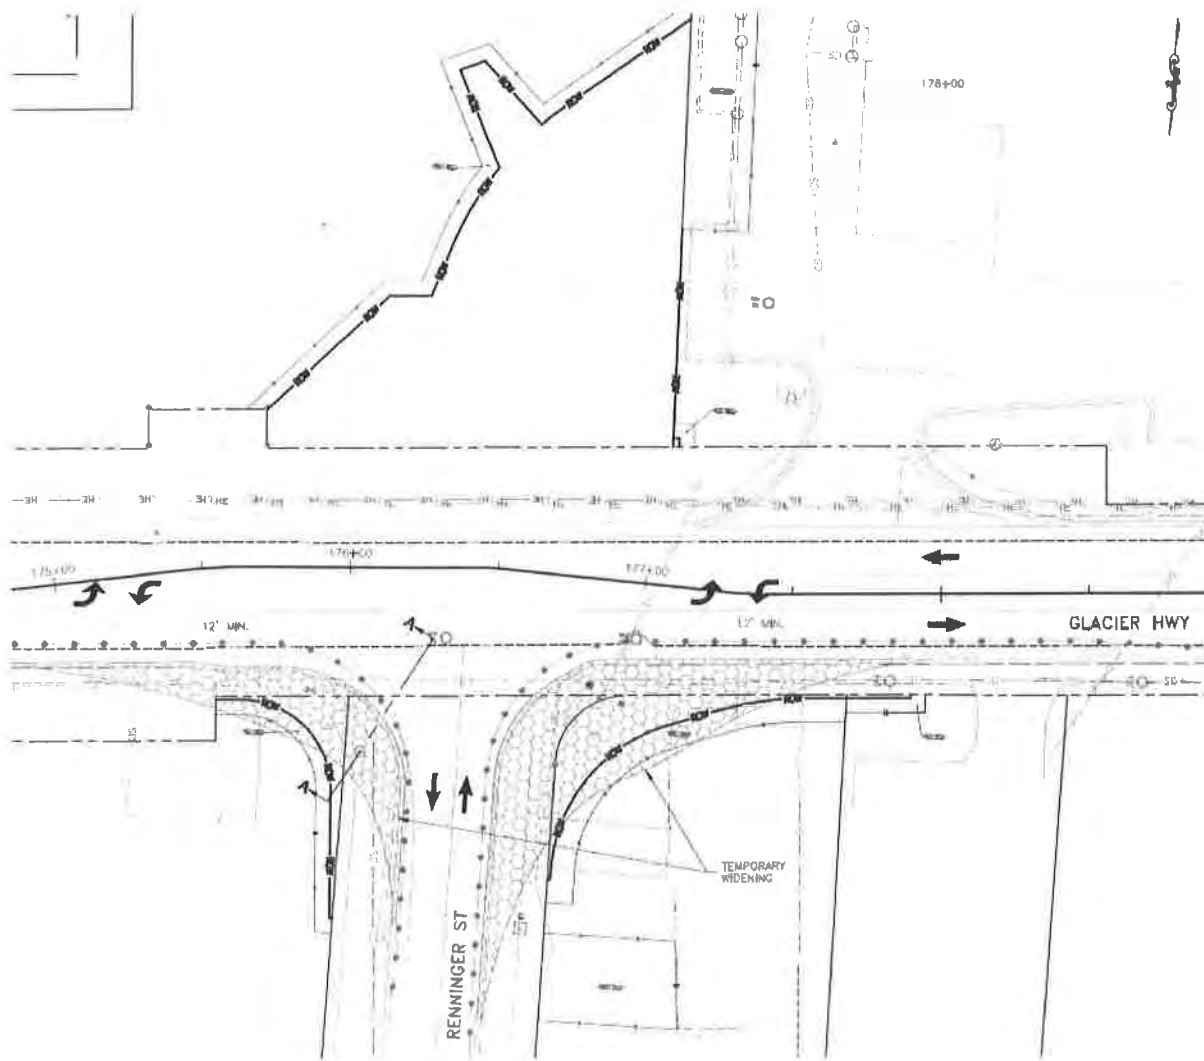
Renninger Roundabout Construction - Pre-Stage 1
